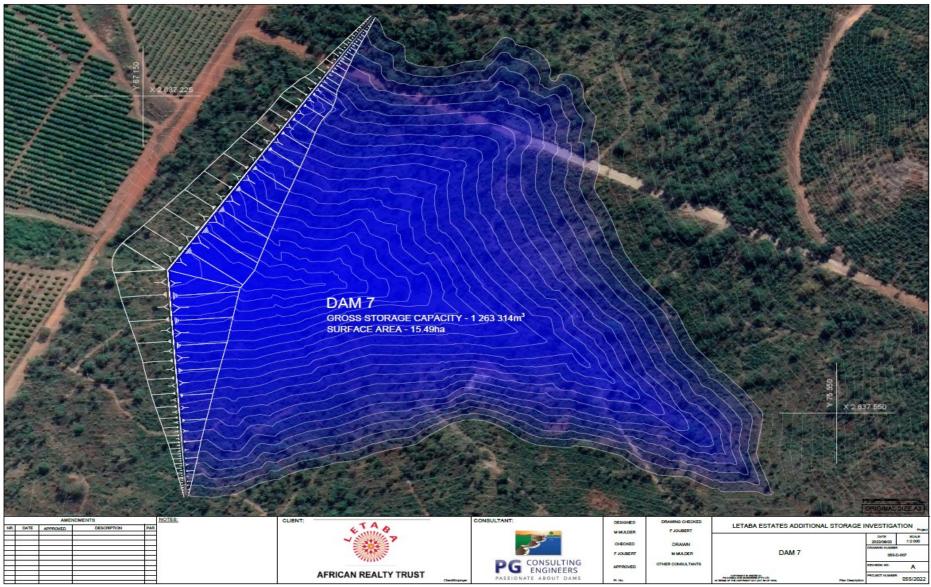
Design Drawing of Dam 6 (previously known as Dam 7 in Engineering Report)
